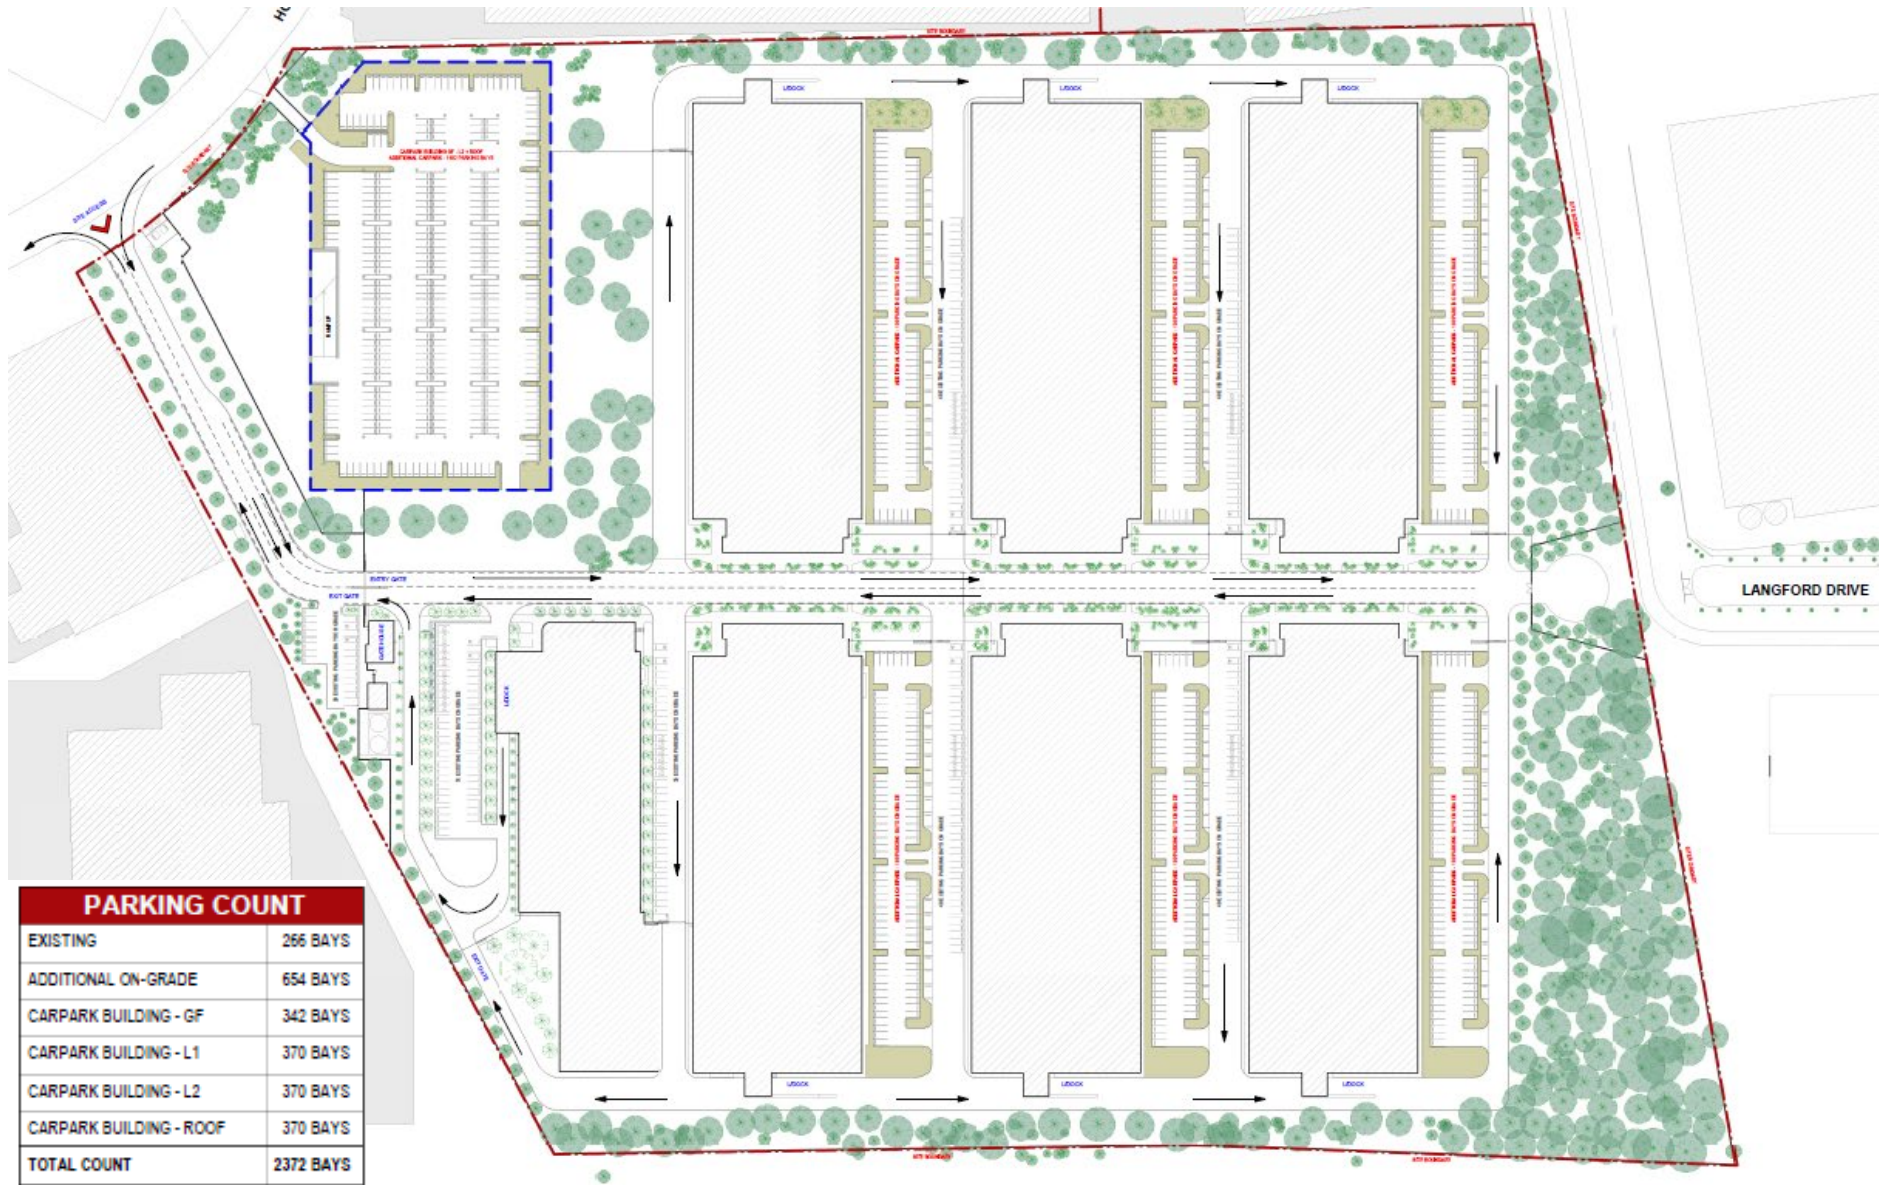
Extract of Adaptive Reuse Car Parking Plan
